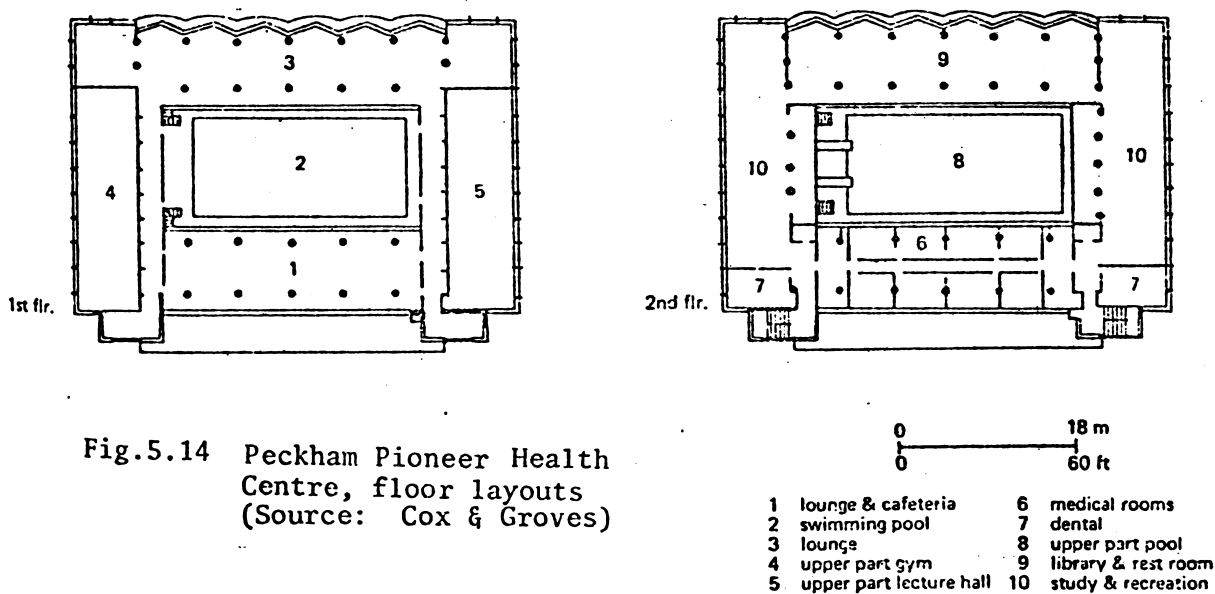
Peckham Pioneer Health Centre, floor layouts (Source: Cox & Groves)
